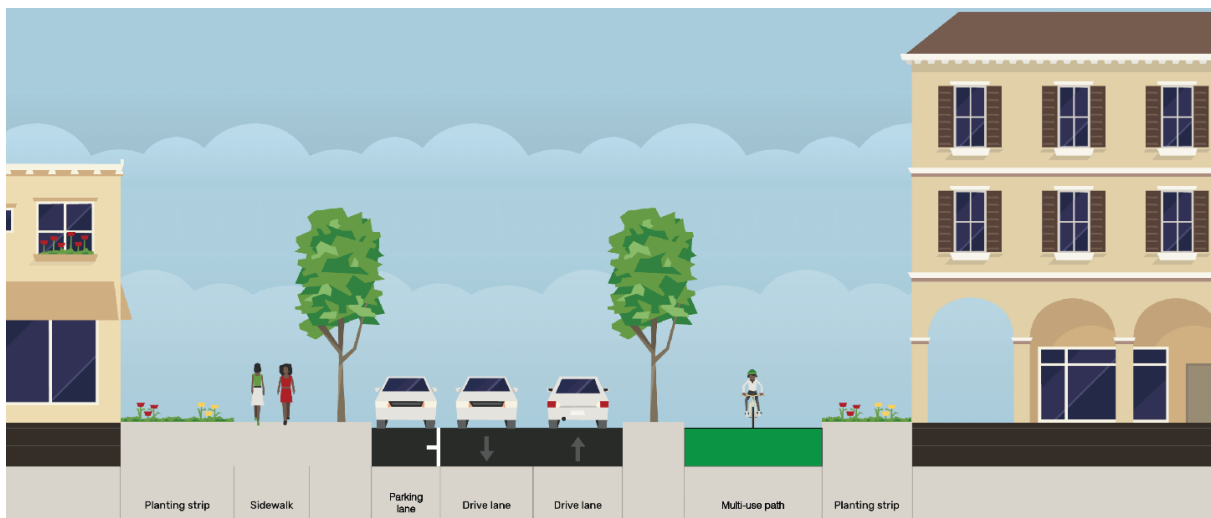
Recommended 23m wide collector road cross-section, prepared by TYLin (Cross section conceptual and NTS)
